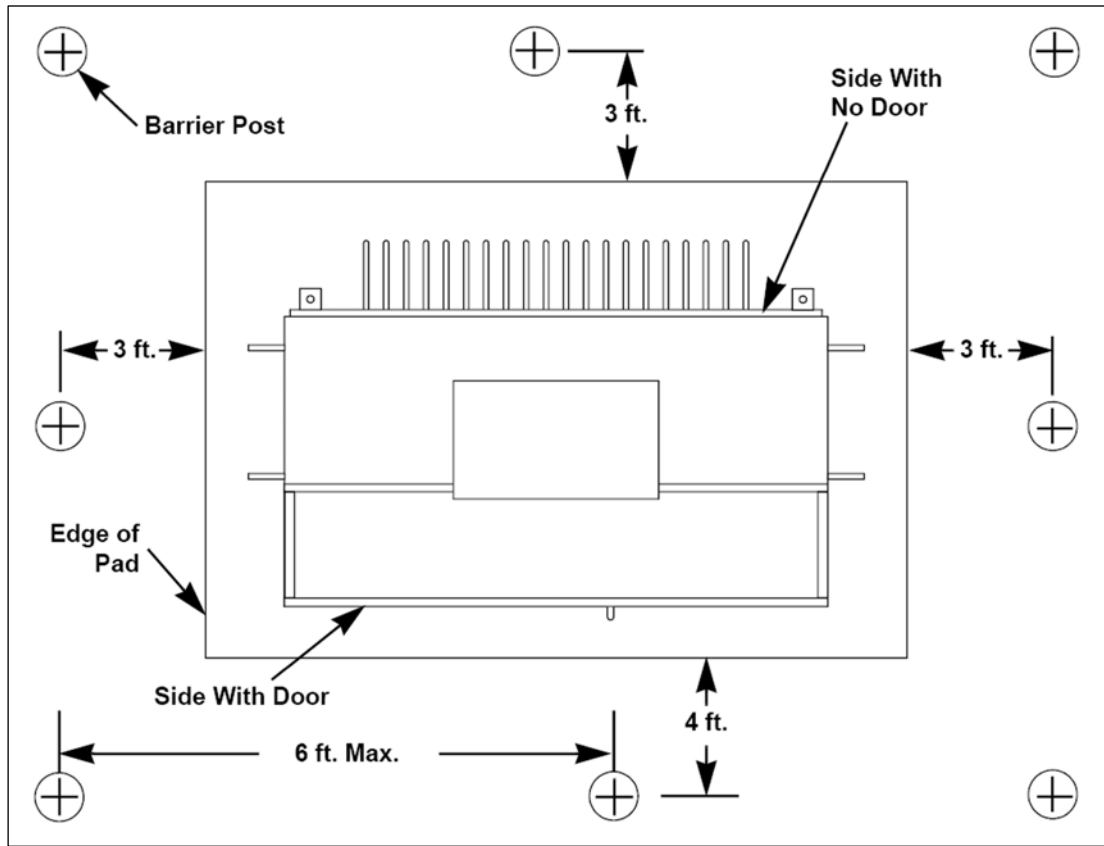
Overhead View of Barrier Post Locations at a Pad-Mounted Installation
